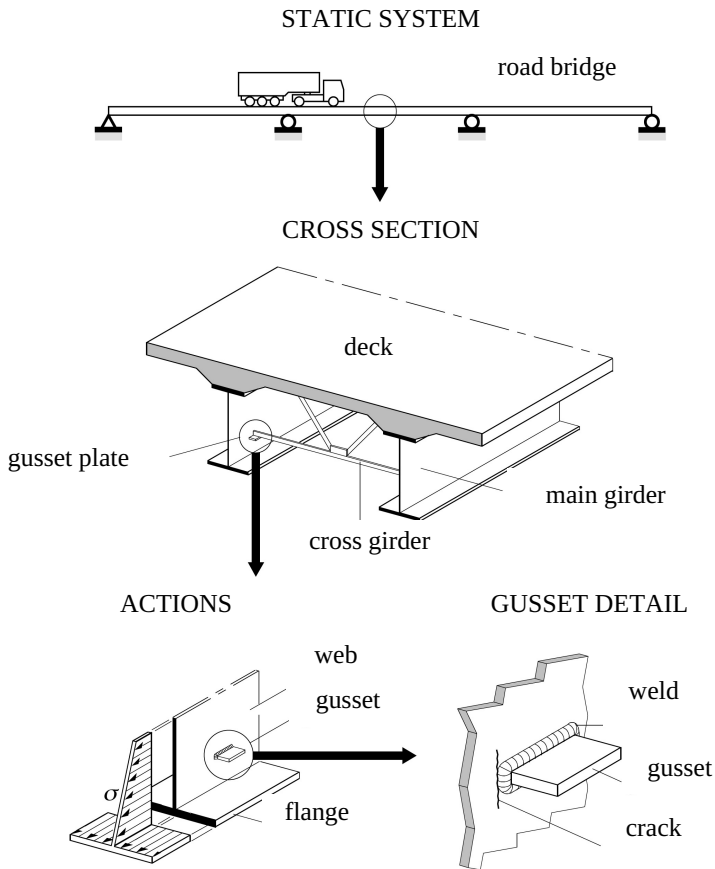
Possible location of a fatigue crack in a road bridge (TGC 10, 2006)
